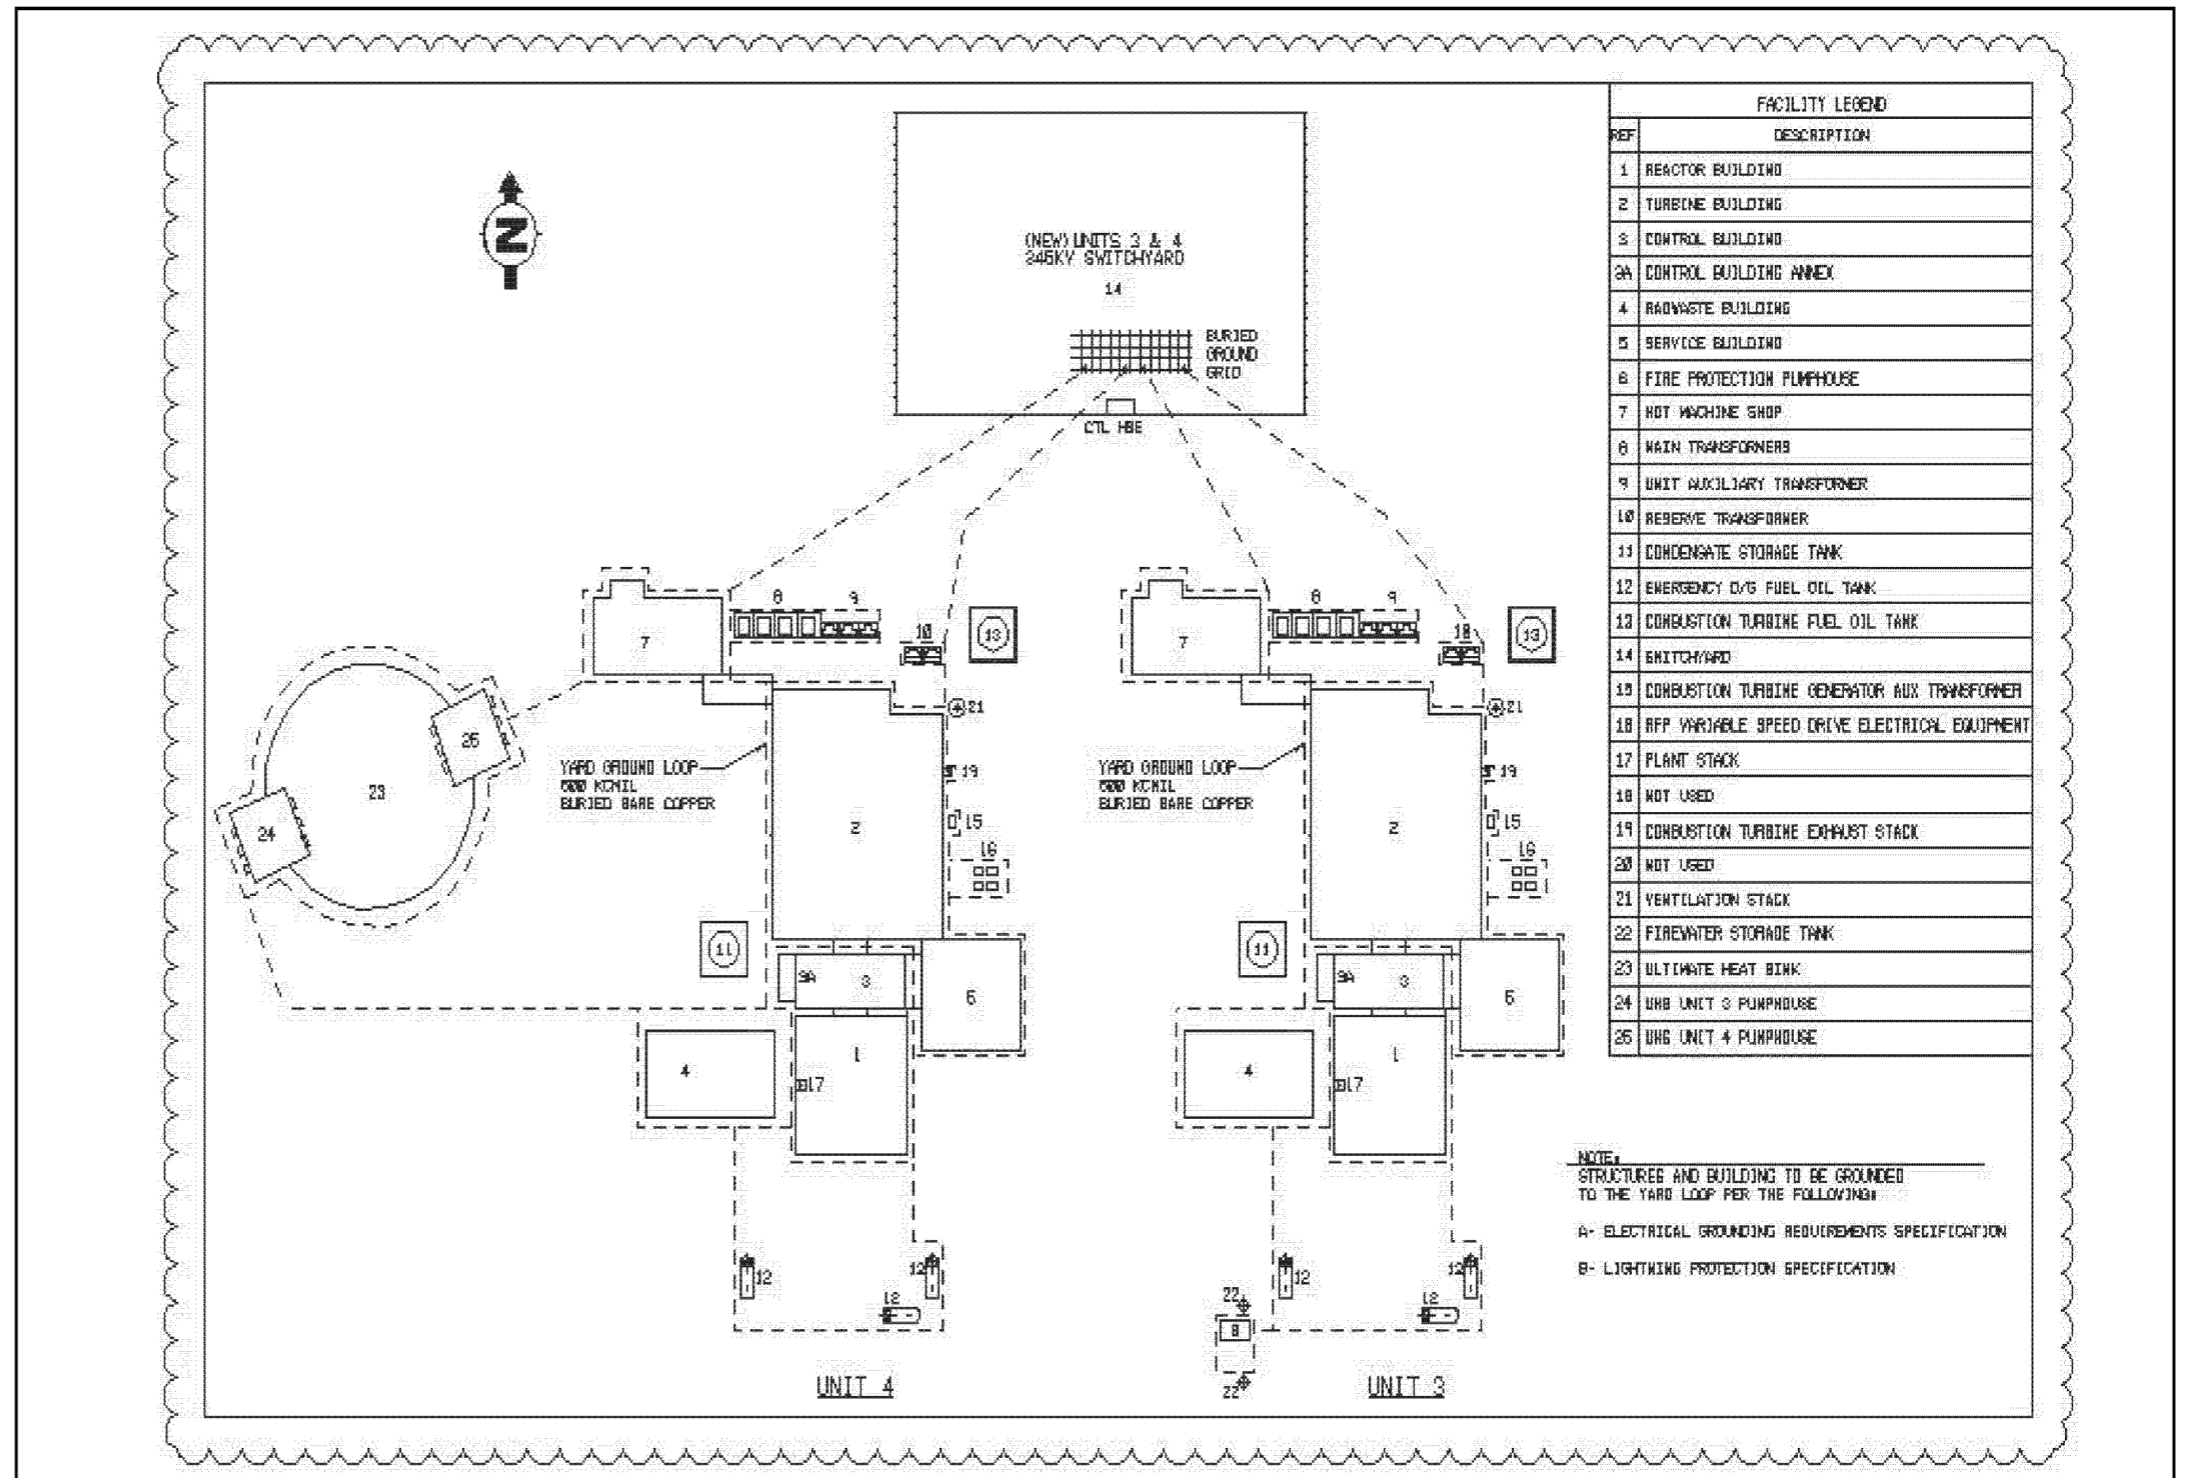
A-1 SITE PLAN (GROUNDING) (Sheet 1 of 1)
